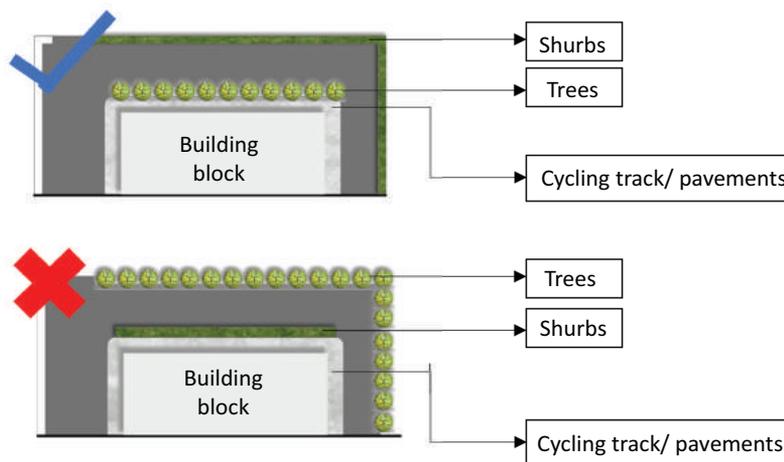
Efficient utilization of trees by planting them inside the facility provides shading to both the road and the pavement
